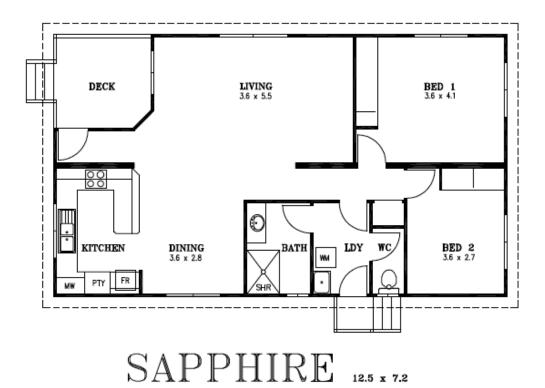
Typical Floor Plan (Norfolk Homes, 2010)
